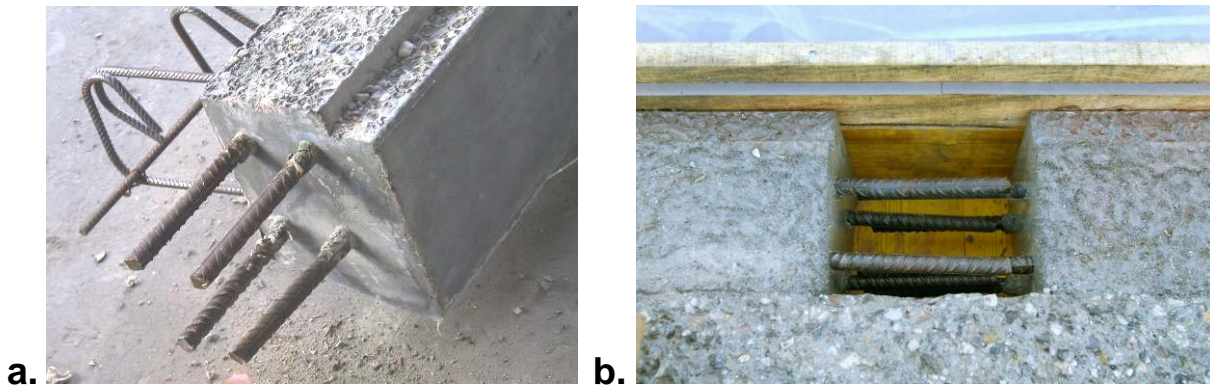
a. detail of connection, b. segments ready for casting of connection, on site.
